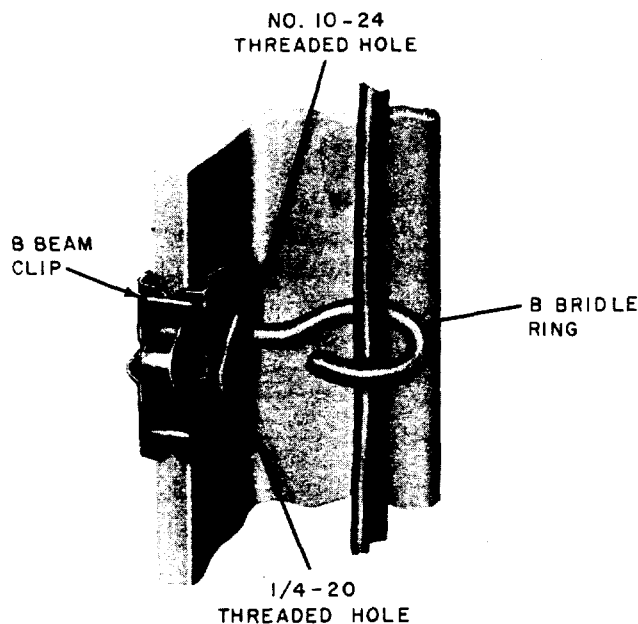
Installed B Bridle Ring Using B Beam Clip
